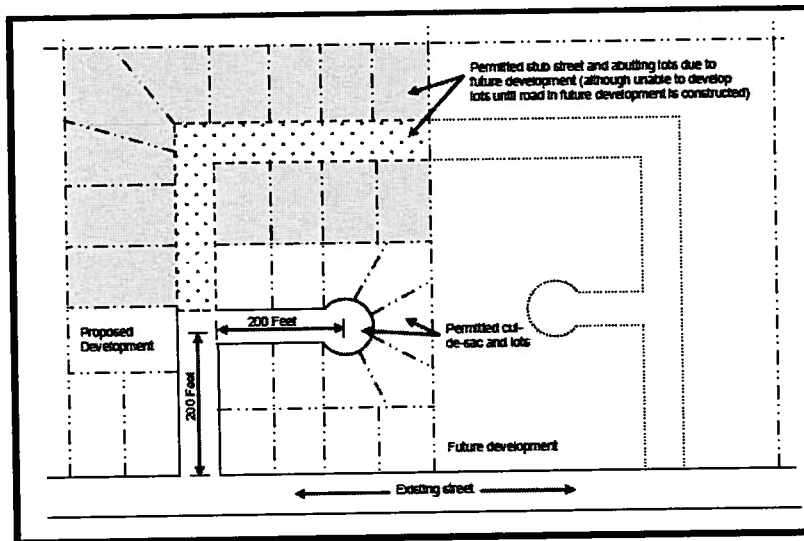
Permitted Cul-de-sac with Permitted Stub Street Extension to Adjacent Property with Future Development Plan
